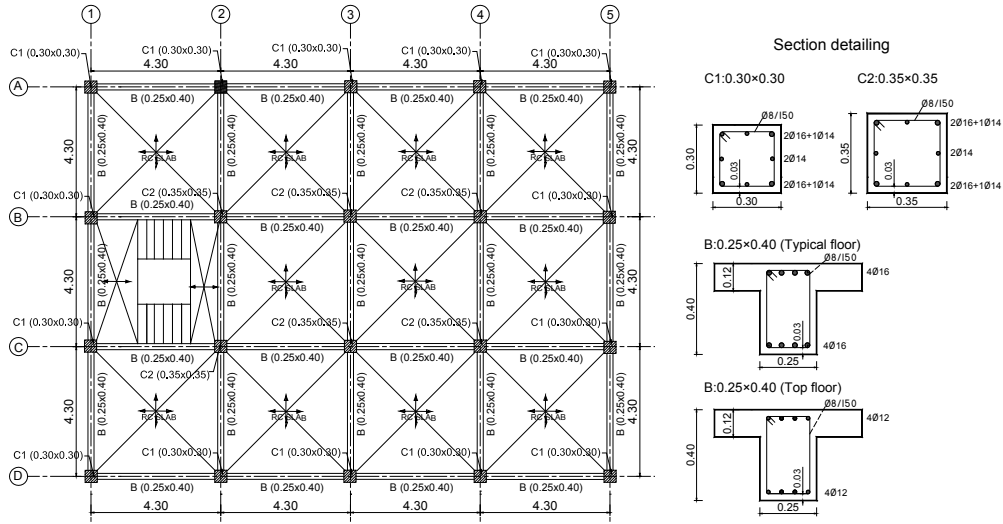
Plan view of a typical story of the 3-R, 4-R and 5-R buildings and design details.
